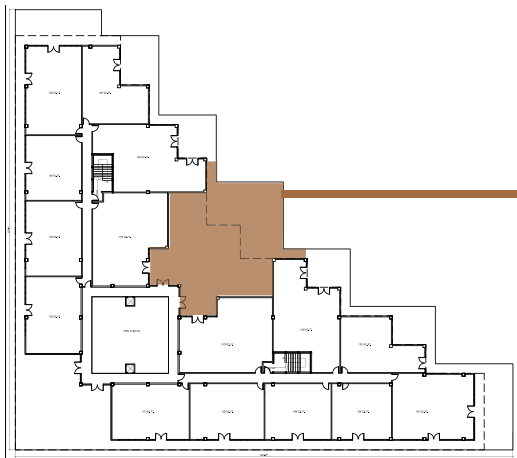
Building floorplan by Lauren Henrie, Jessica Nguyen, Sydney Greer, and Katelyn Lindstrom.
